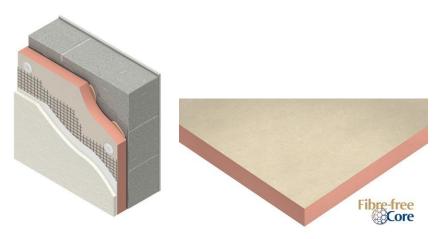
Kooltherm K5 External Wall Thermal Insulation, (Kingspan, Kingspan KoolthermTM K5 External Wall Board, 2022)
